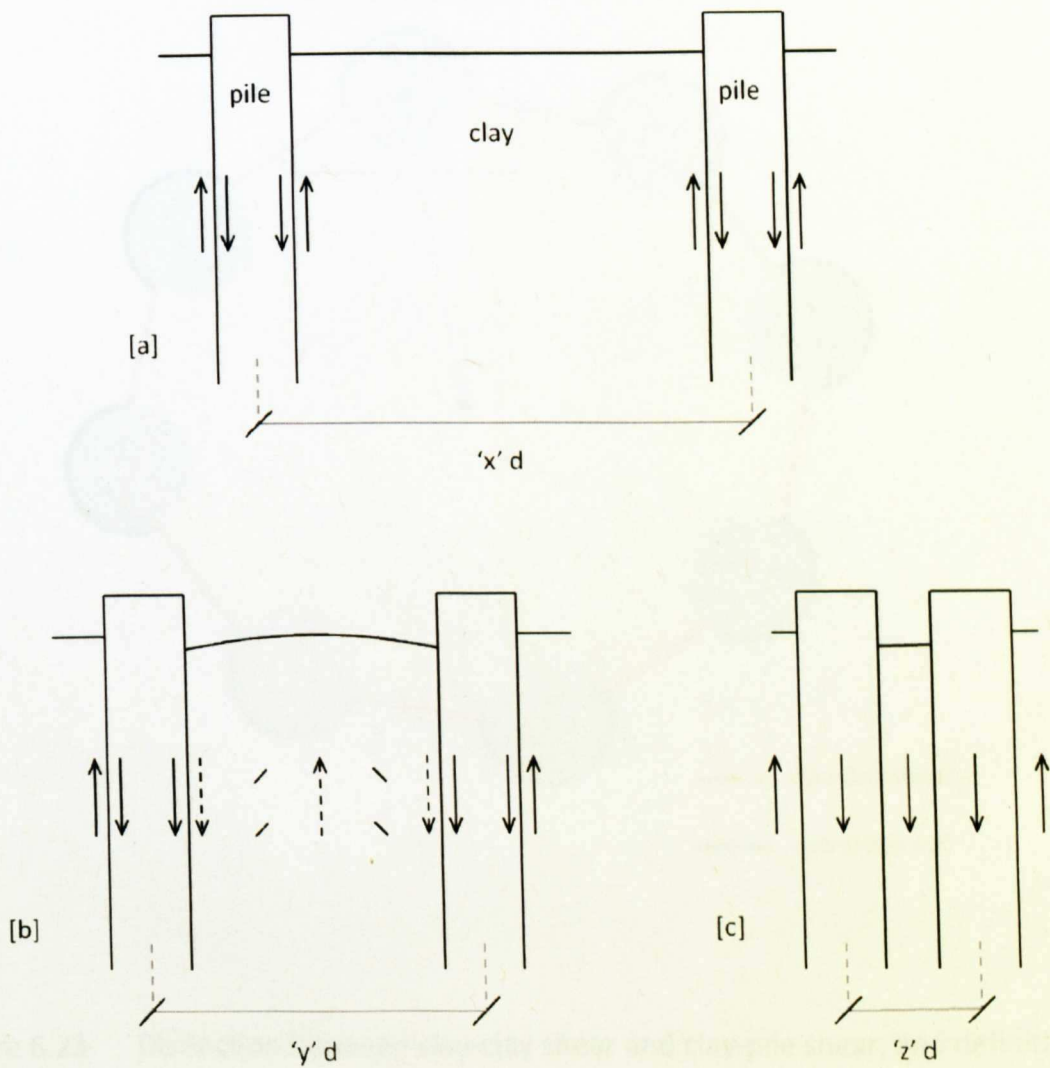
Idealised failure mechanism cross sections: [a] individual failure, [b] 'block effect' failure, [c] block failure
